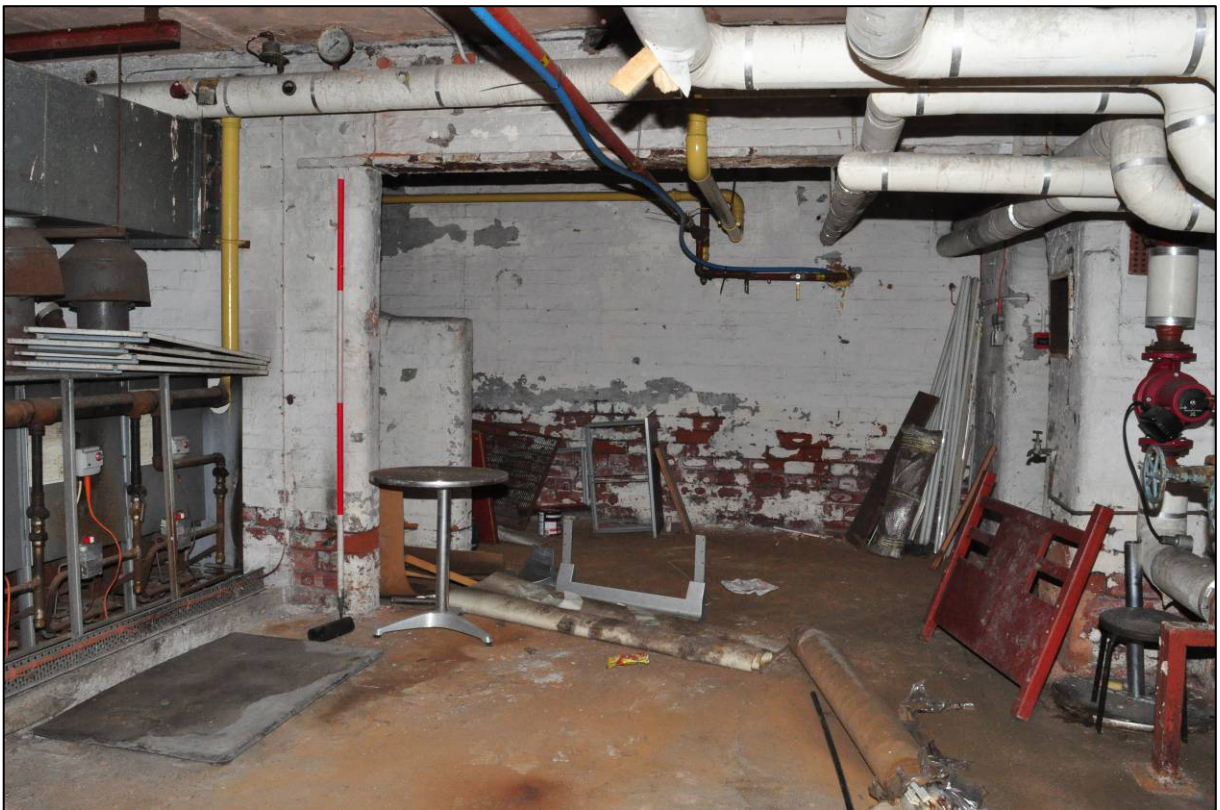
1879 Board School, former heating apparatus room (B2), looking W (photo 2380).
